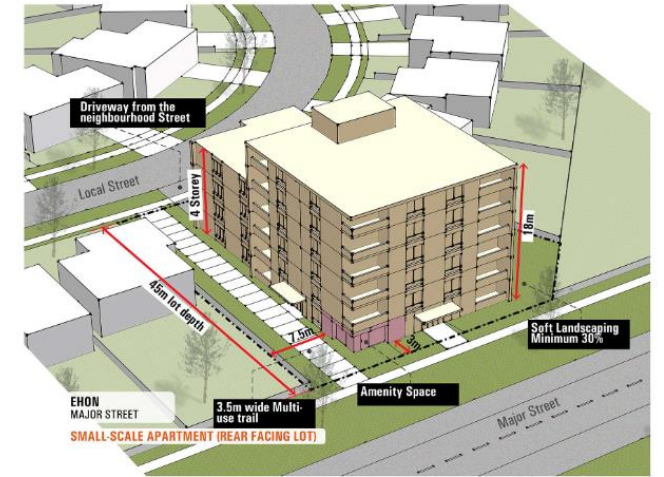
Potential Massing Models with Small-Scale Apartment on Rear Facing Lots on Major Streets
